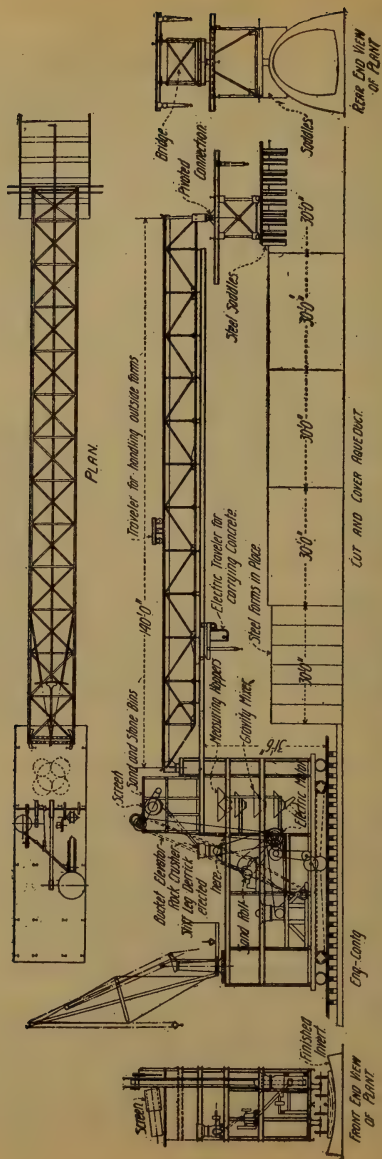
General Plans Showing Elevation, Plan and End Sections of Portable Plant.
